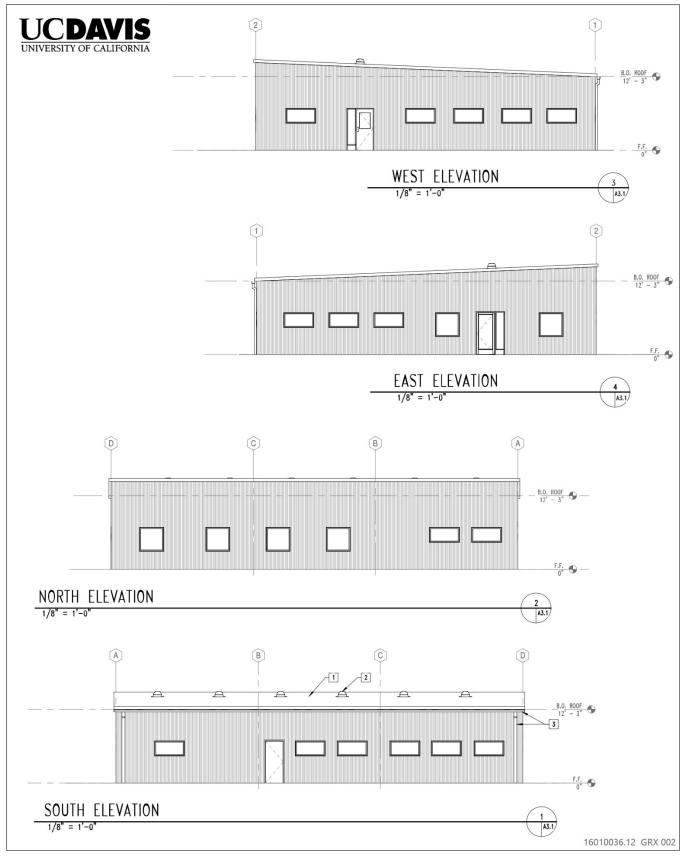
Proposed ARS WRU Exterior Building Elevation
